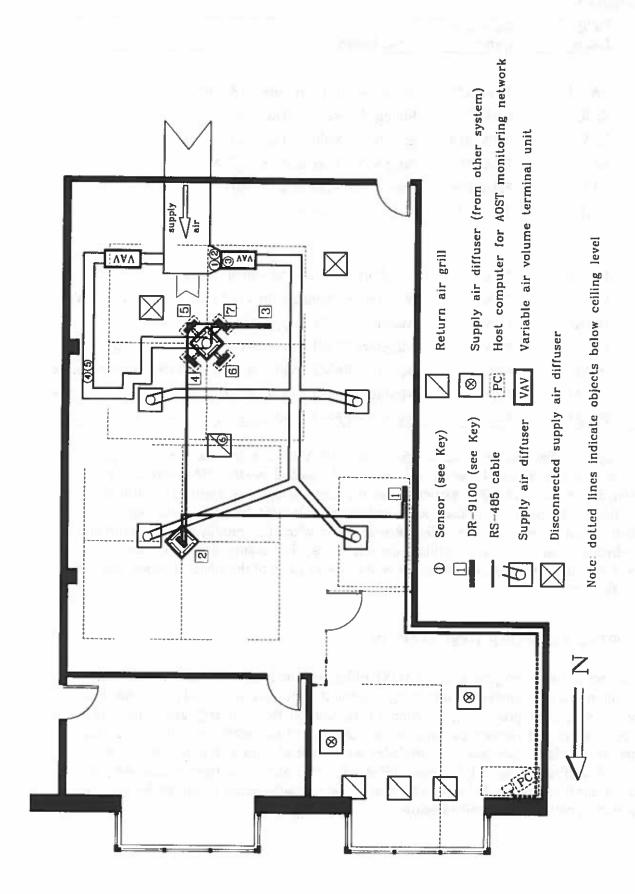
Advanced Office Systems Testbed: Ceiling Plenum Plan
